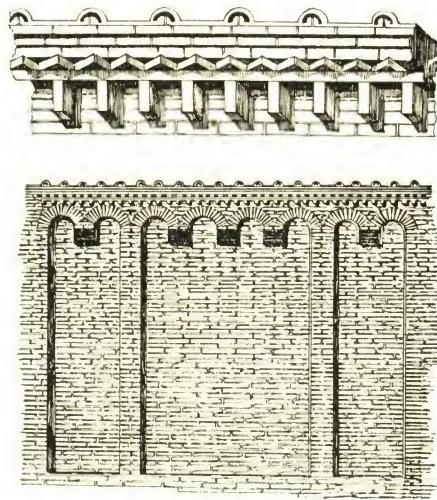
Wall and Cornice, Chapel of San Pier Crisologo, Ravenna.
